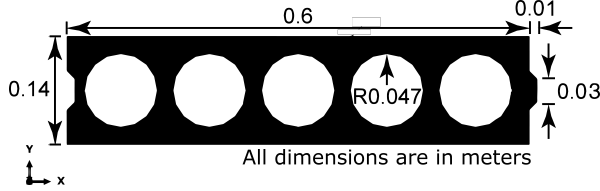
Section geometry of the 140 mm x 600 mm panel with five circular cores of an internal radius of 47 mm. Dimensions are
